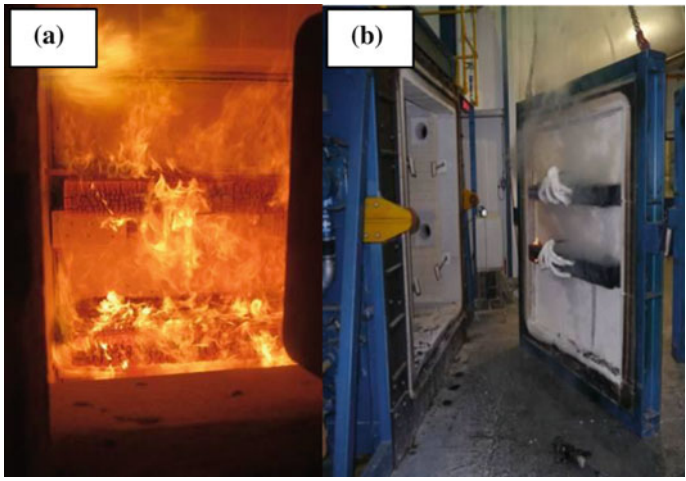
Fire test specimens: a just after fire test and b after removed the fire
